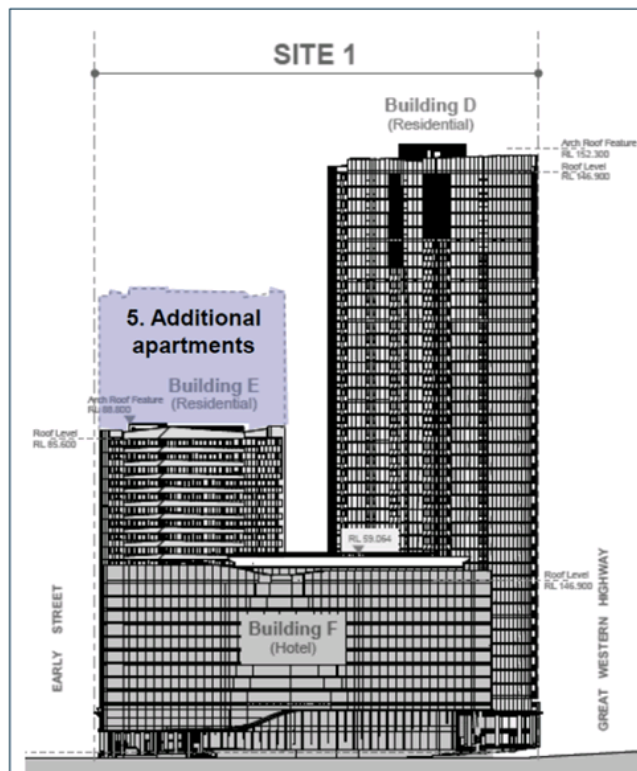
Proposed additional 10 storeys on Building E, Site 1
